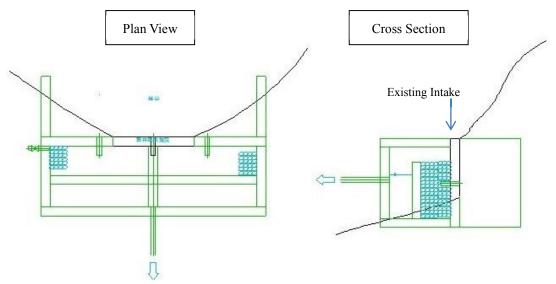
Typical Structure of Intake Facility (Making Use of Existing Intake Facility)
